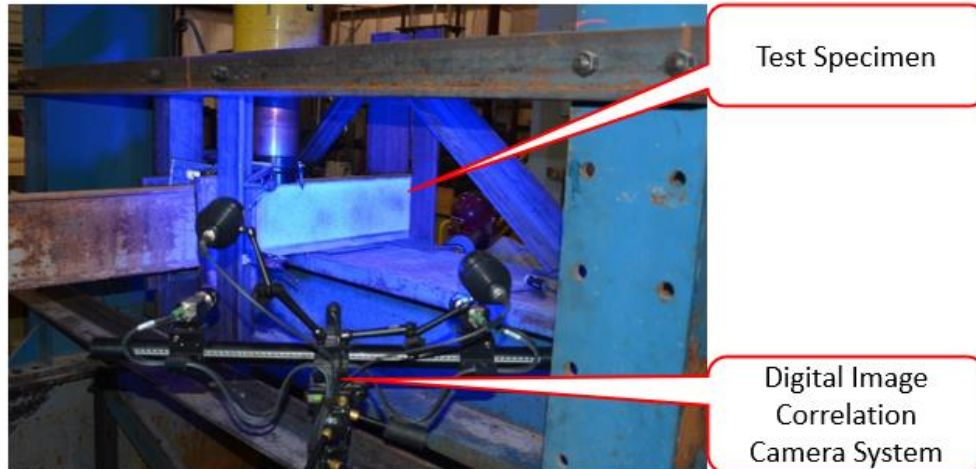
North Support View of Full-Scale Beam Testing Configuration
